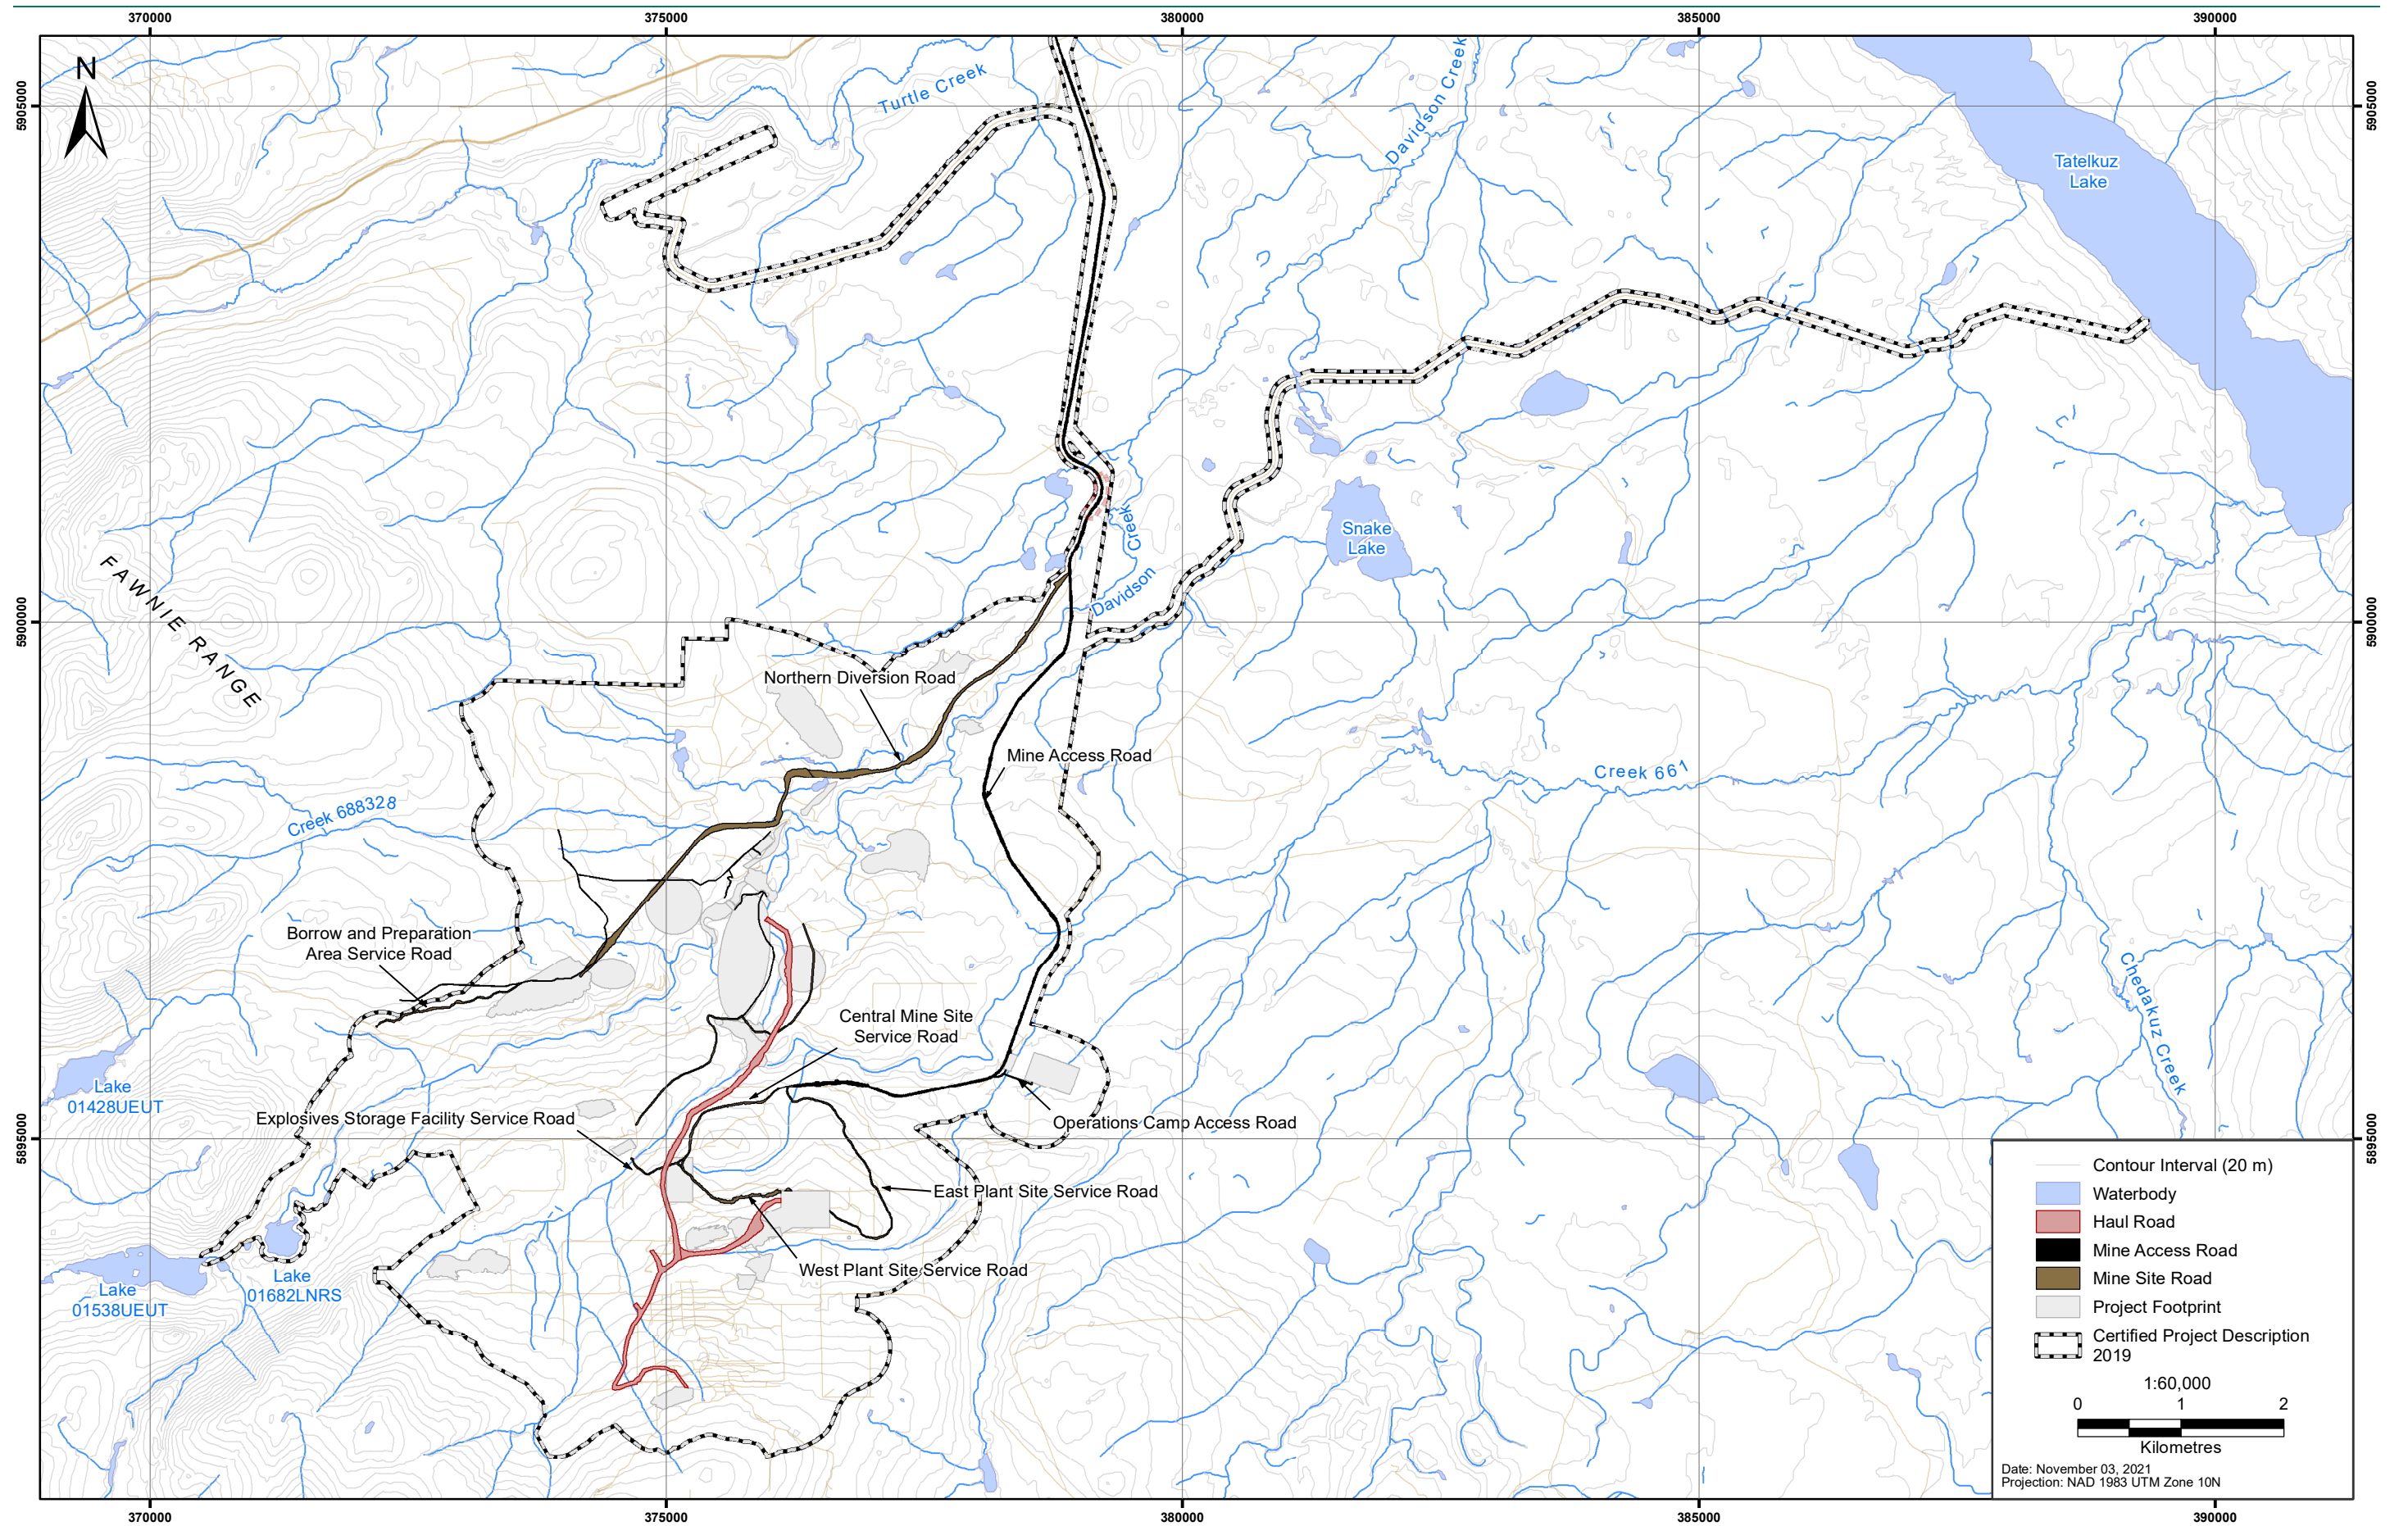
General Arrangement of Roads at the End of Construction (Year -2)
